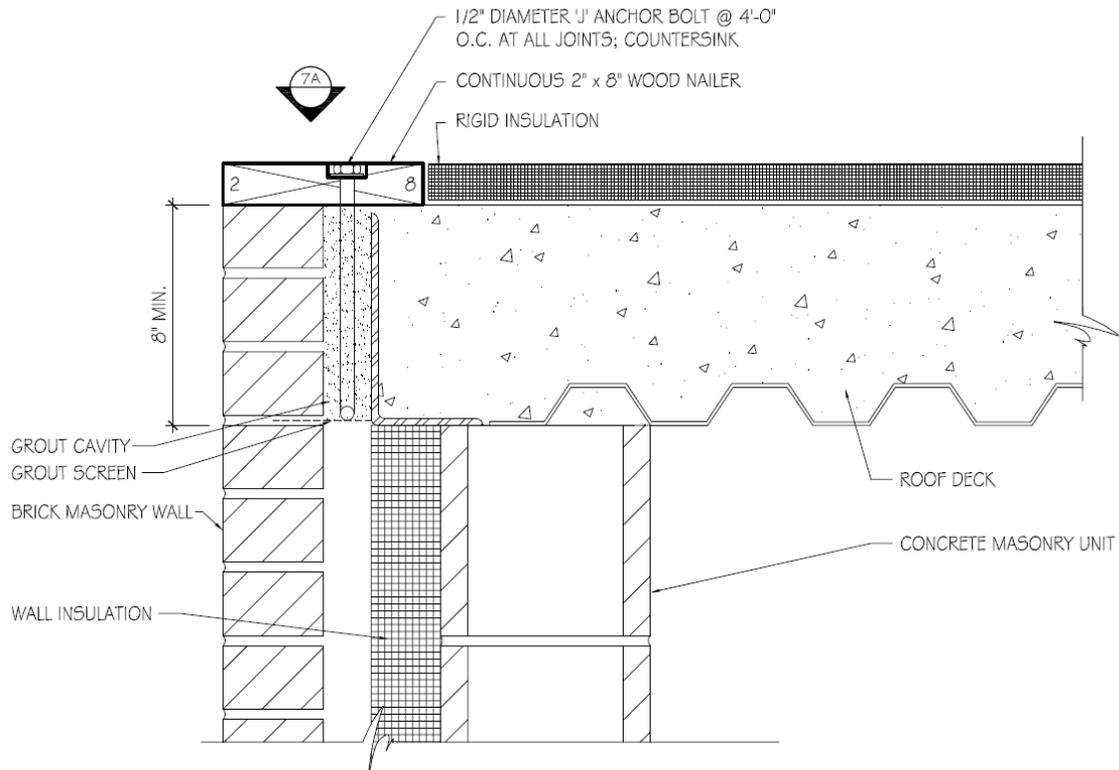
ROOF EDGE WOOD BLOCKING - ANCHOR BOLT SECUREMENT
